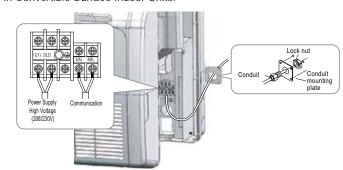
Simplified View of Indoor Unit Terminal Connections—Floor Standing
